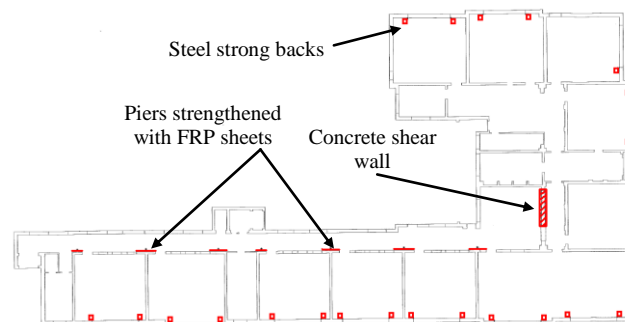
Floor plan of Shirley Community centre showing retrofit.
